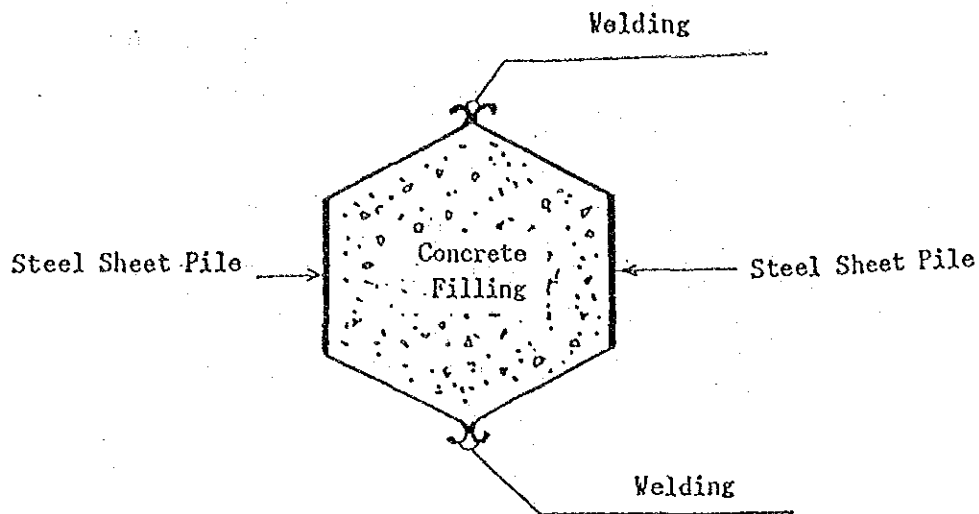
Cross-Section of Pile in Existing Old Wharf
